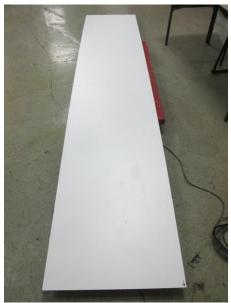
Exposed Surface of the Test Specimen (Pre-test)
